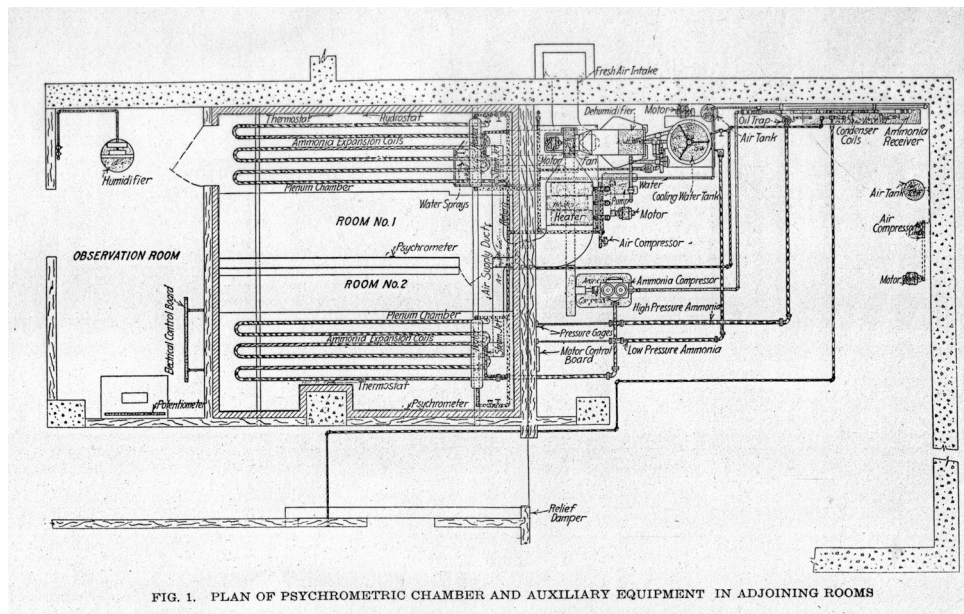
PLAN OF PSYCHROMETRIC CHAMBER AND AUXILIARY EQUIPMENT IN ADJOINING ROOMS
